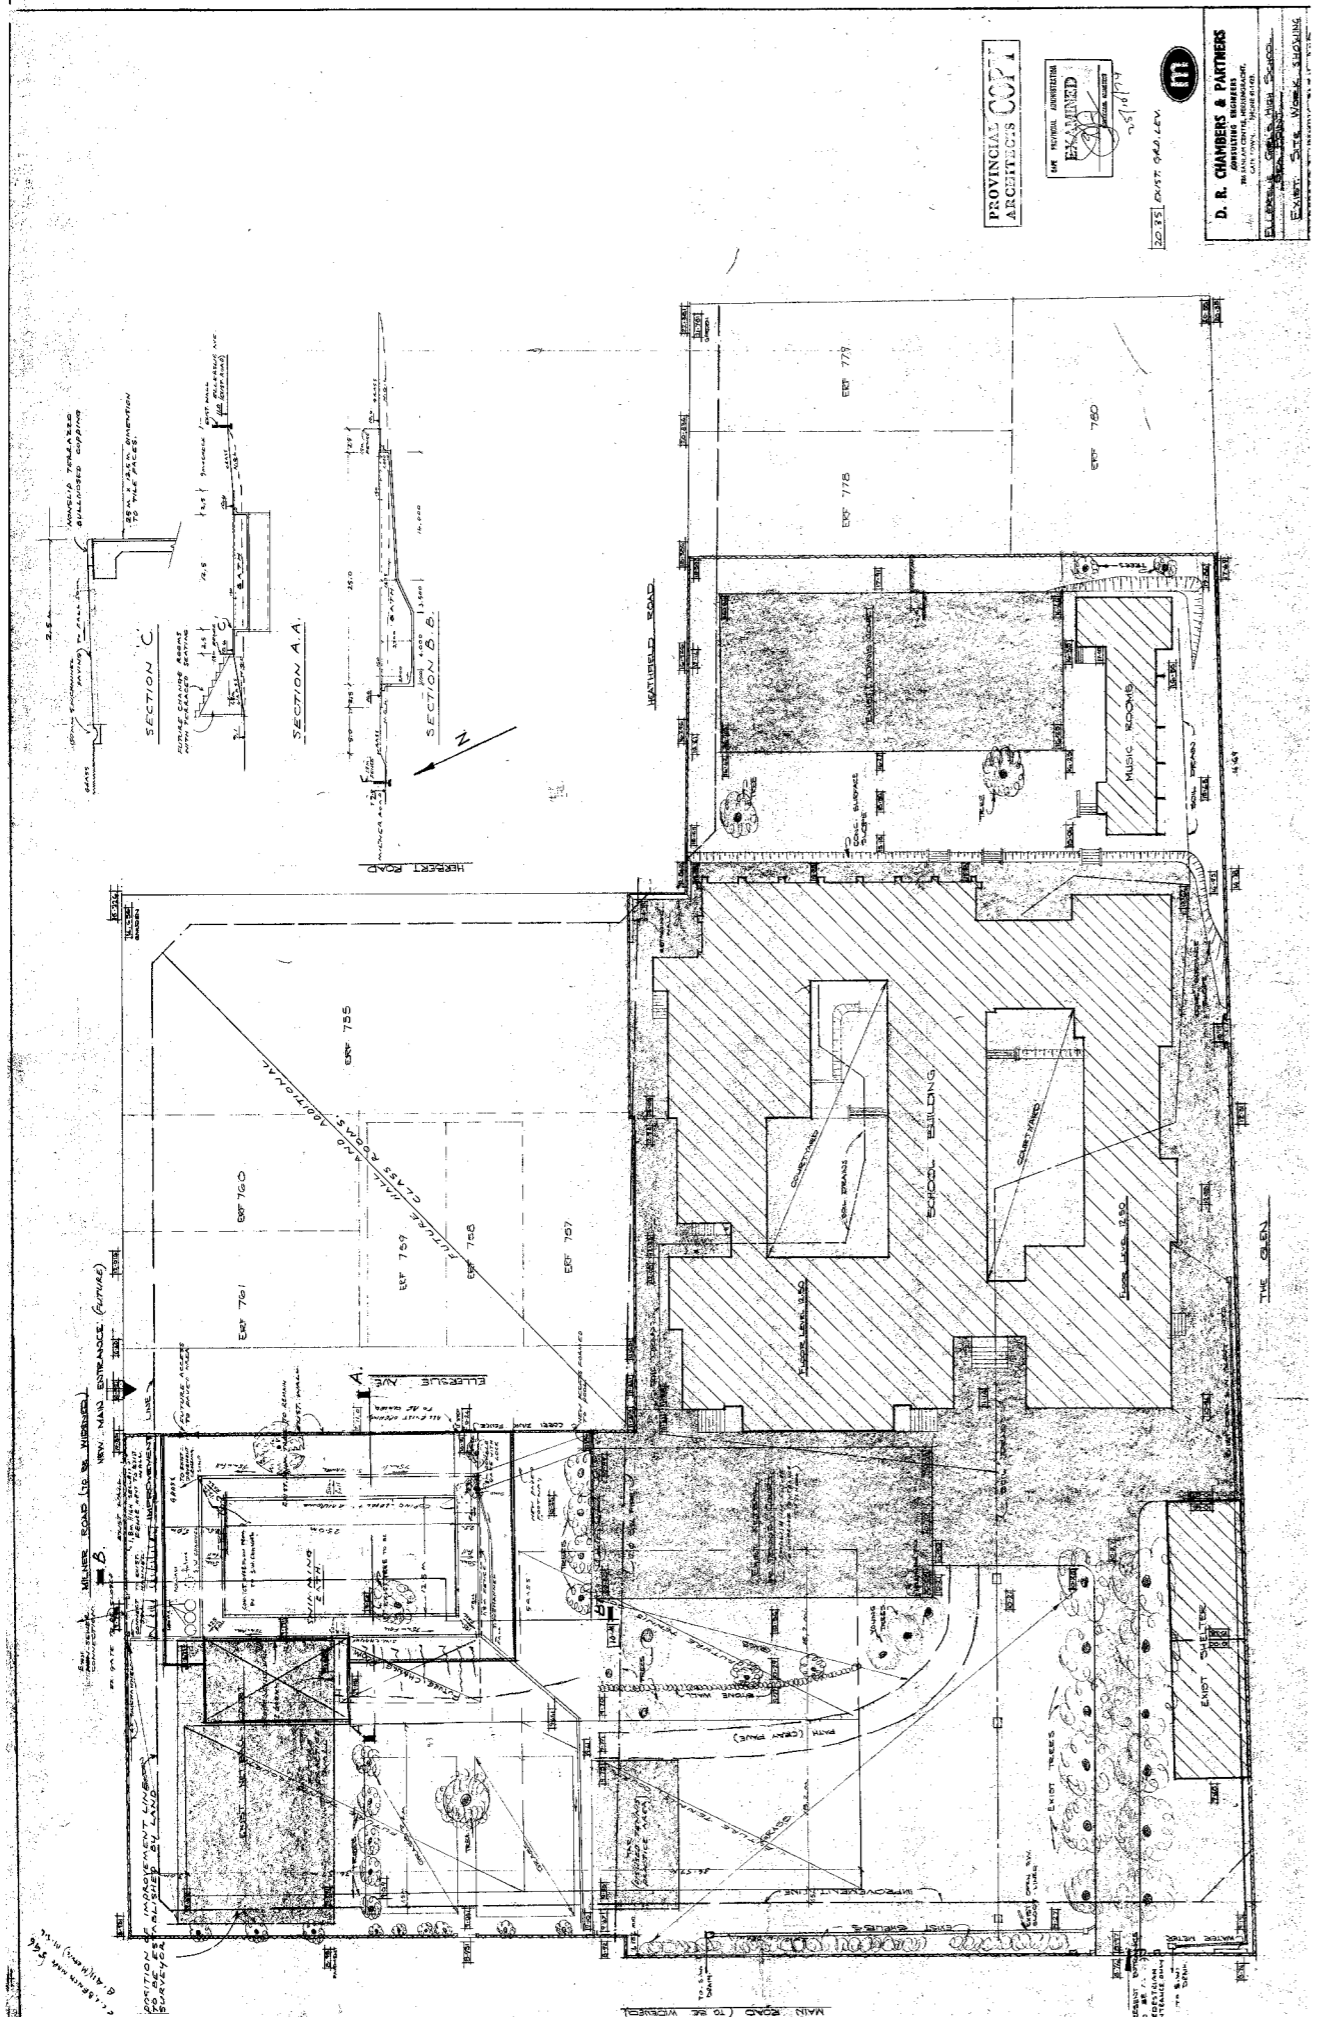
PWD site plan, 1974 (WCG Archive, 2023)
